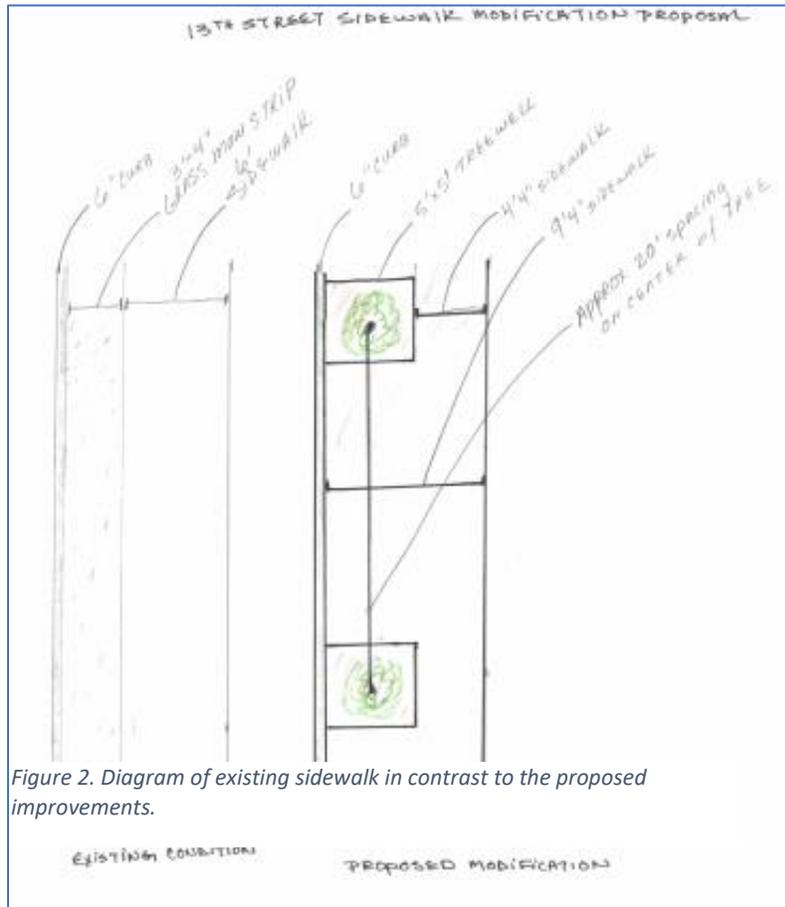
Diagram of existing sidewalk in contrast to the proposed improvements.
